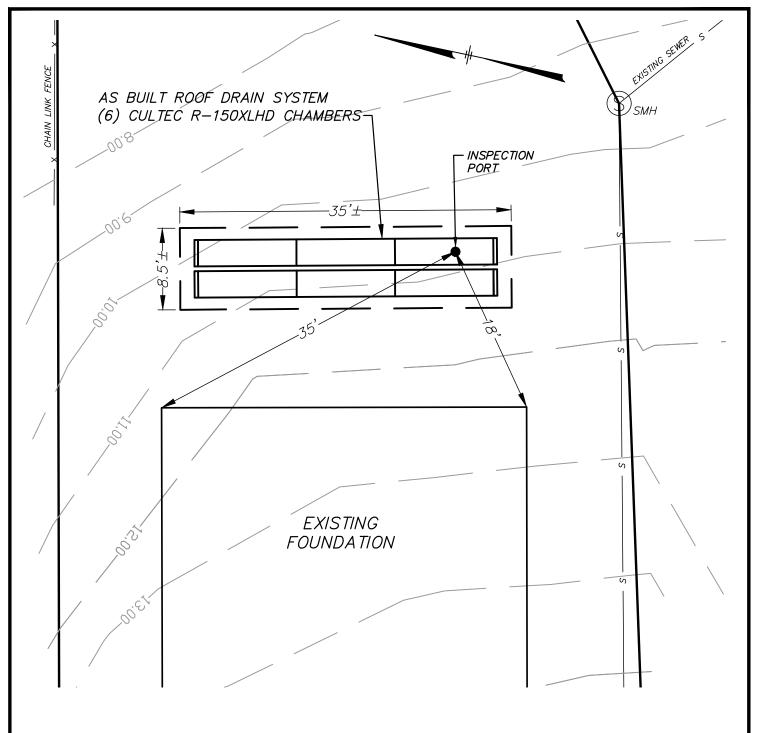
Roof drain infiltration system – Lot 1 at 47 Spy Pond Lane, Arlington, MA
